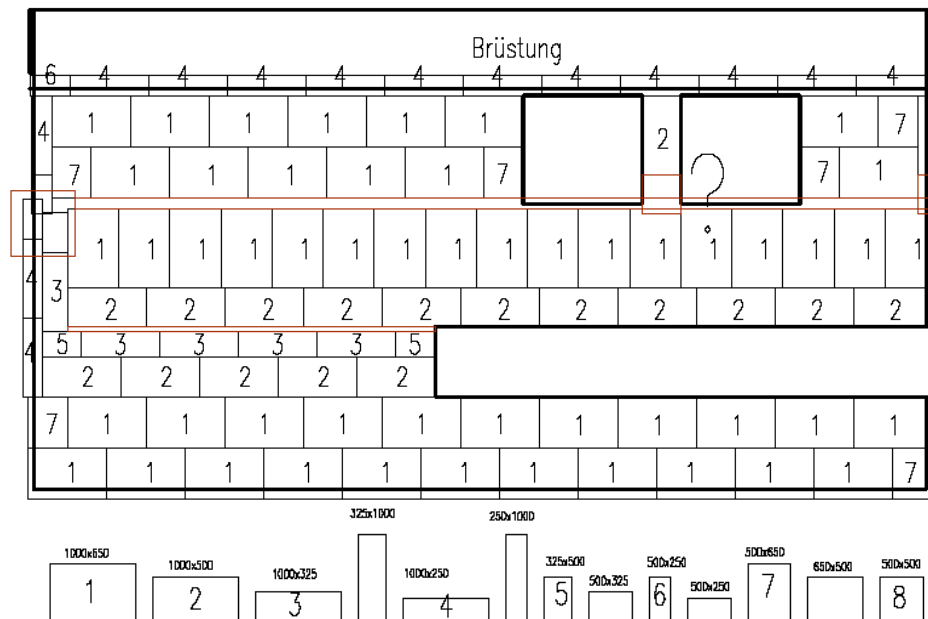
Facade plan of the Petrisberg/Trier passive house
